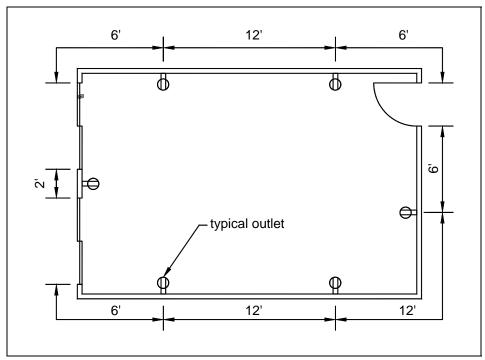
TYPICAL OUTLET DISTRIBUTION
